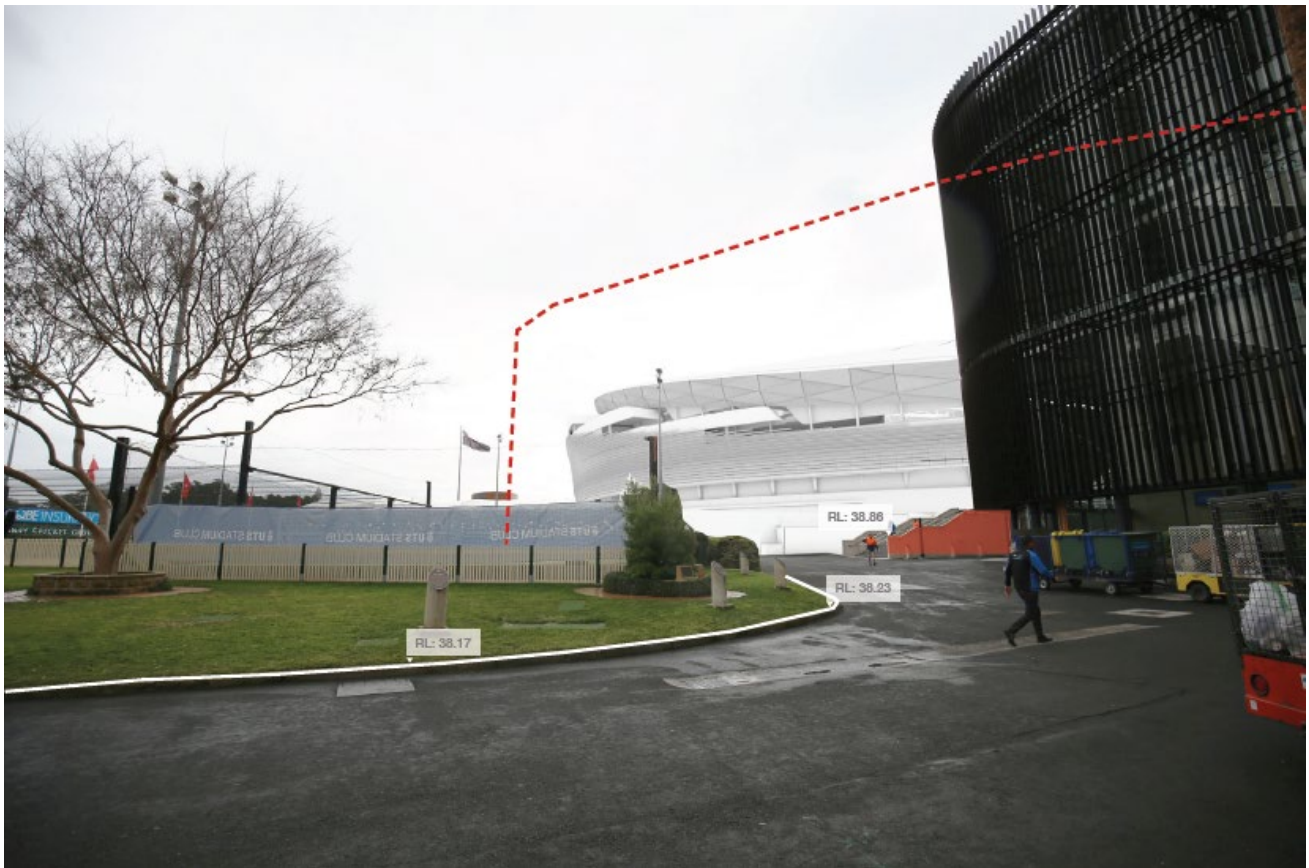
View location 14: SCG Forecourt to North of Member's Stand, concept envelope view
